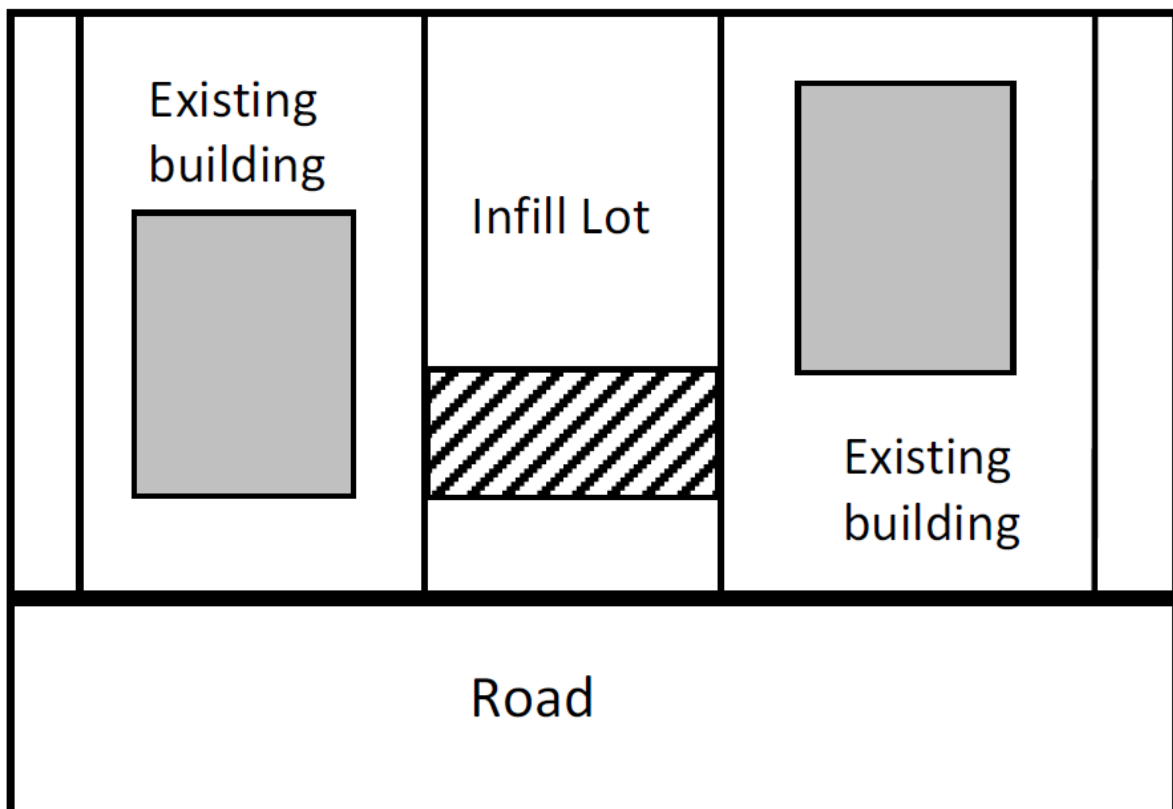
Primary Frontage Setback for Infill Lots
